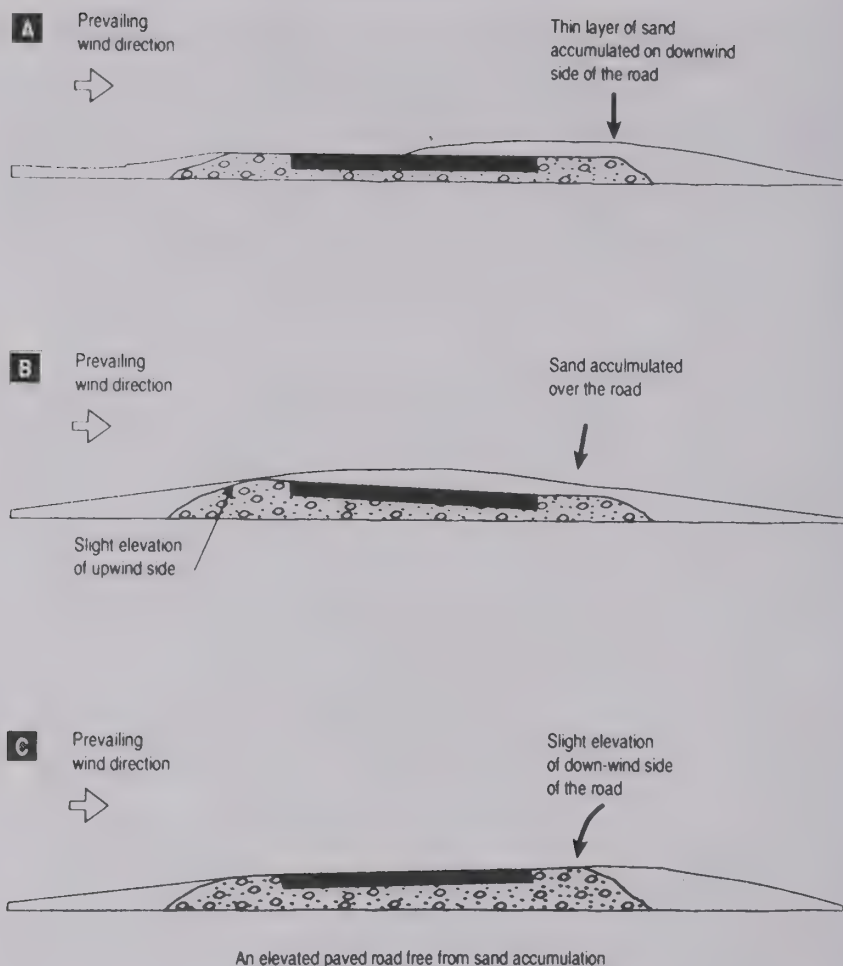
Deposition of sand along a road with a horizontal profile (A); and upwind elevation (B); and a downwind elevation (C) based on studies of Gharib et al., 1985 in Kuwait air bases.
